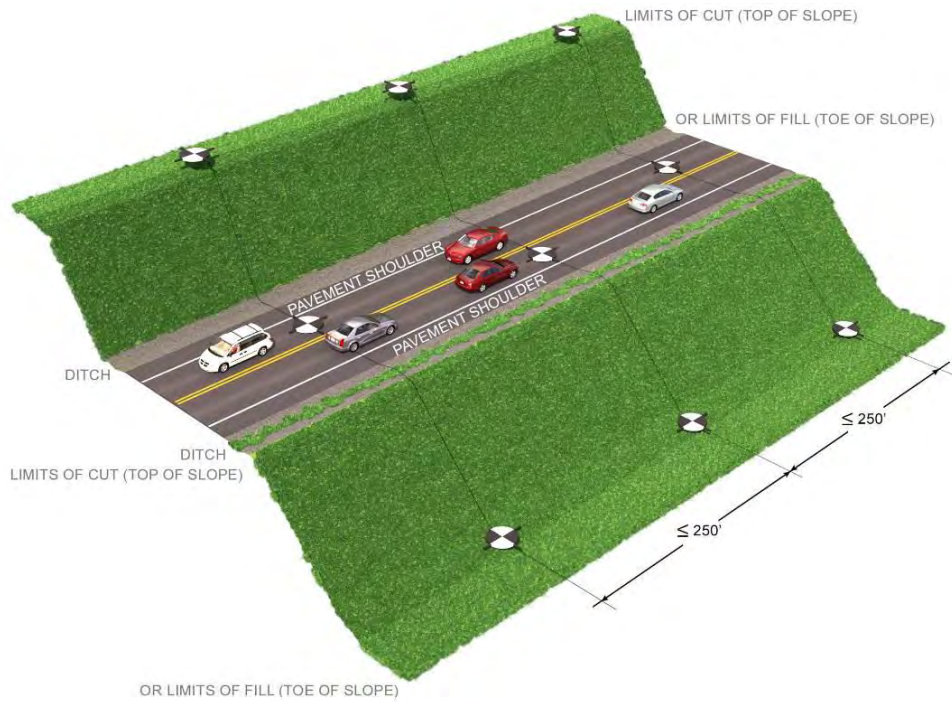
| Example of Soil Test Boring Layout for a Two-Lane Road Constructed over Embankment and/or Cut Slope Higher Than 25 Feet
